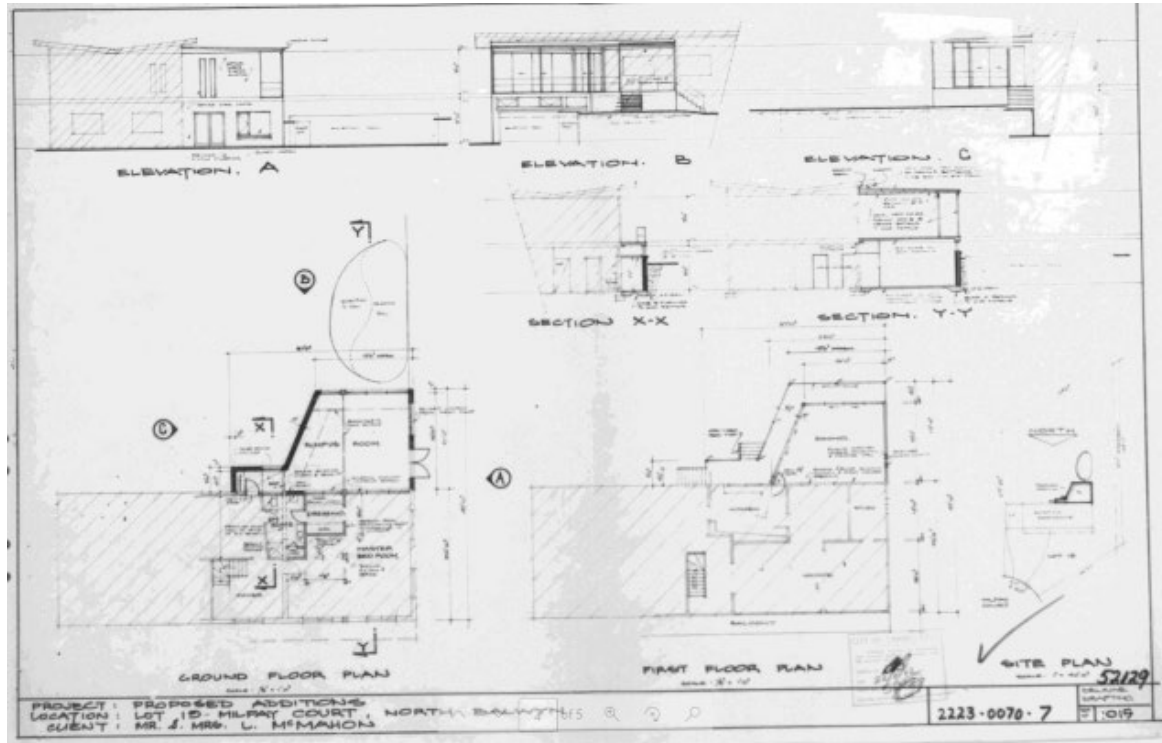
Working drawing of rear extension undertaken in 1972 adding a rumpus room and dining room. (Source: BP 52129)
